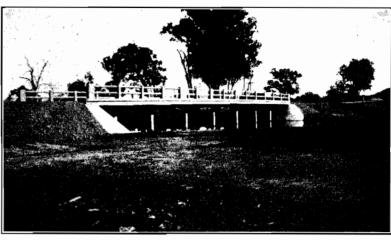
Showing new bridge erected on the Kiewa River Flats at Bonegilla.
